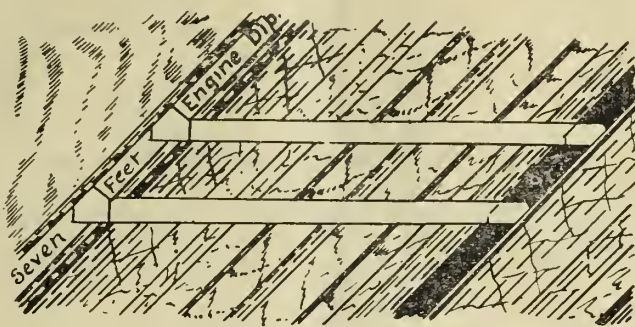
SECTION SHOWING "ENGINE DIP," "CRUTS," AND LEVELS IN REARER WORKINGS.
